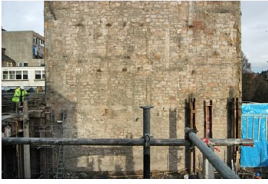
Rectified west-facing elevation of 90 Princes Street
